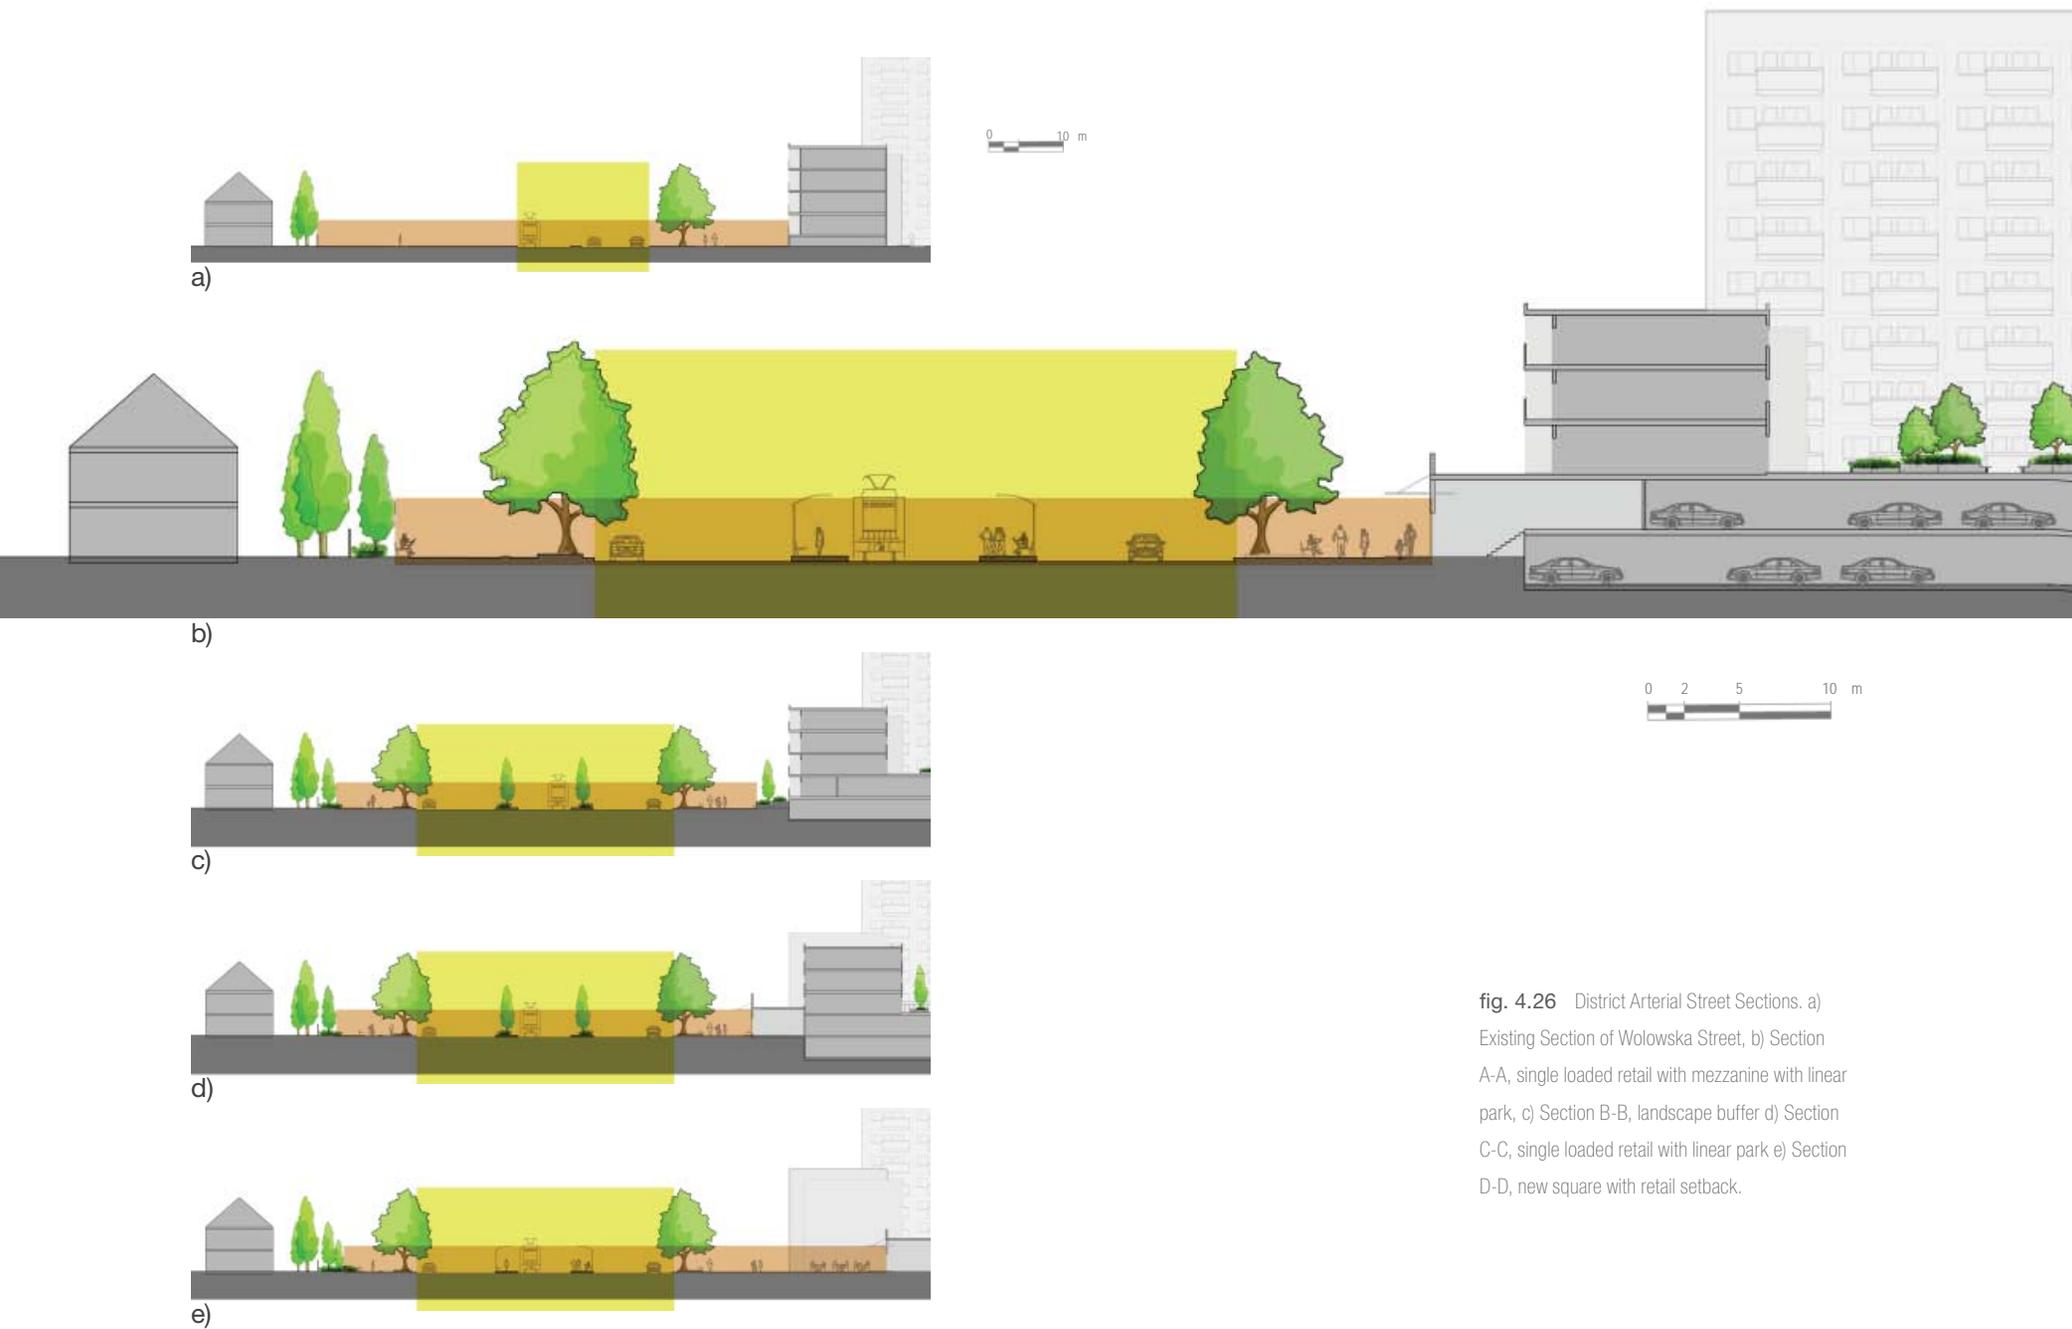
District Arterial Street Sections. a) Existing Section of Wolowska Street, b) Section A-A, single loaded retail with mezzanine with linear park, c) Section B-B, landscape buffer d) Section C-C, single loaded retail with linear park e) Section D-D, new square with retail setback.
